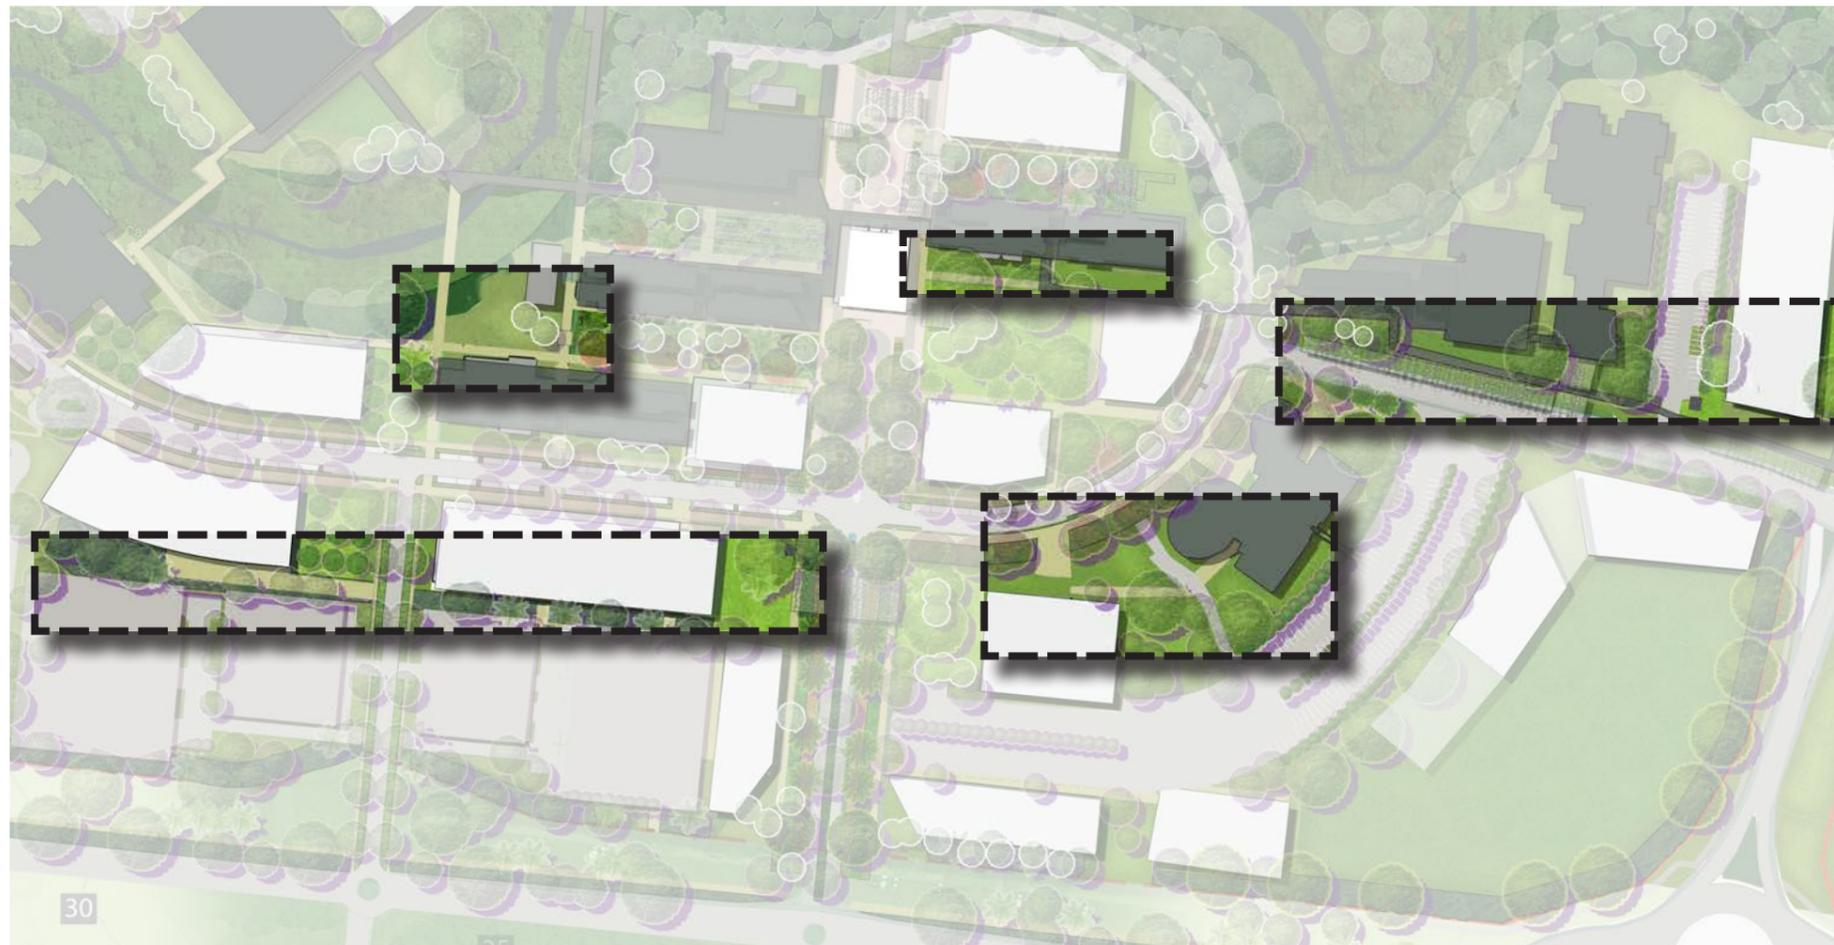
BUILDING EDGE ACTIVATION ZONES HIGHLIGHTED
